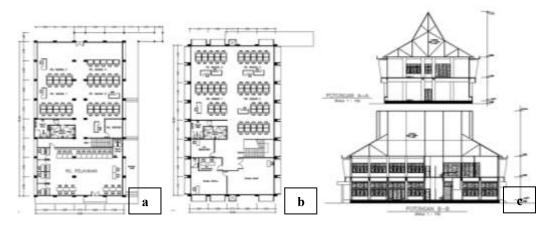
(a) 1st floor plan (b) 2nd floor plan (c) building sections.
